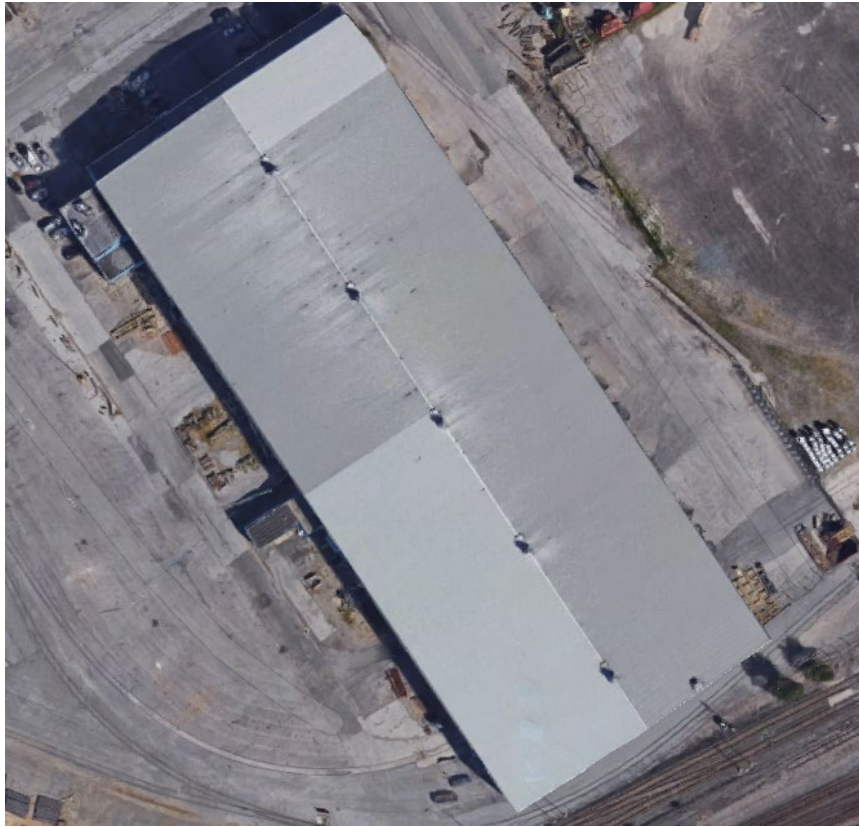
Aerial image of the main warehouse roof. The roof is a structural standing seam metal roof. A portion of the roof in the northeast corner and the southwest side has been repaired previously. There are areas of staining and apparent corrosion occurring as well.
